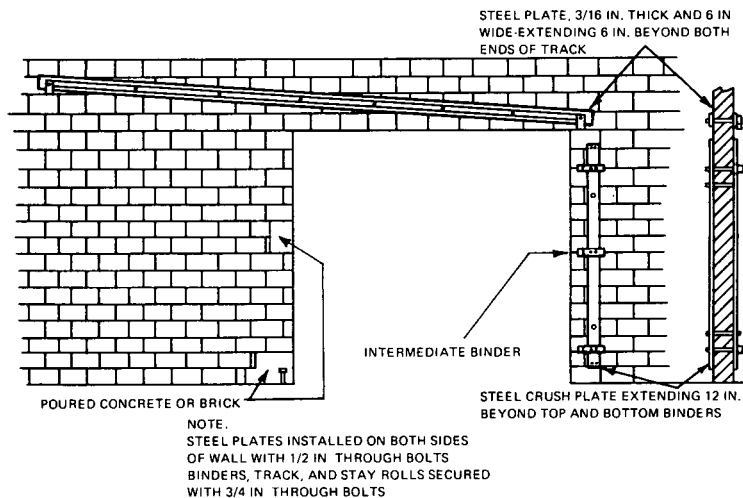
Hollow concrete masonry wall prepared for a single sliding door.
